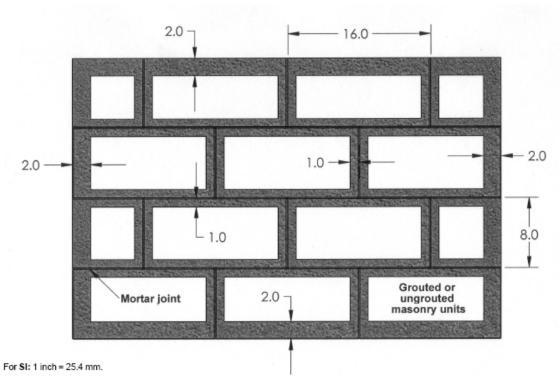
ANCHOR LOCATIONS (LIGHT COLOR AREAS) FOR INSTALLATION IN MASONRY UNITS (ALL DIMENSIONS IN INCHES)
